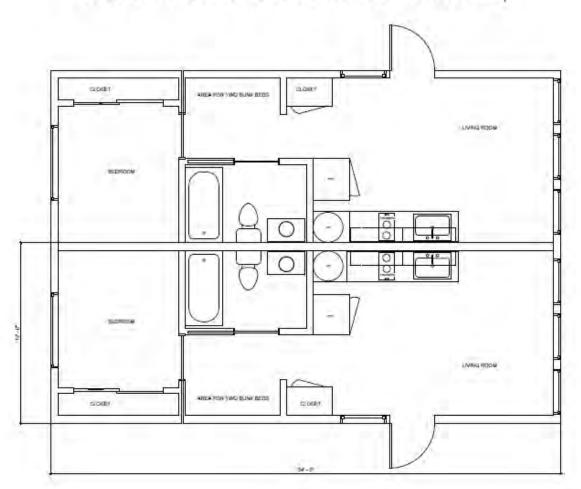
RESIDENTIAL UNIT SAMPLE FLOOR PLAN
